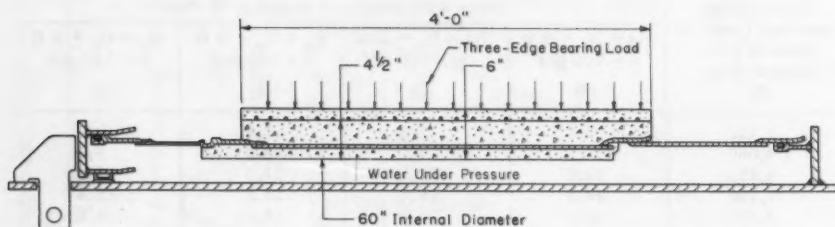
SCHEMATIC VIEW OF PIPE SPECIMEN ASSEMBLED ON INTERNAL BULKHEAD
